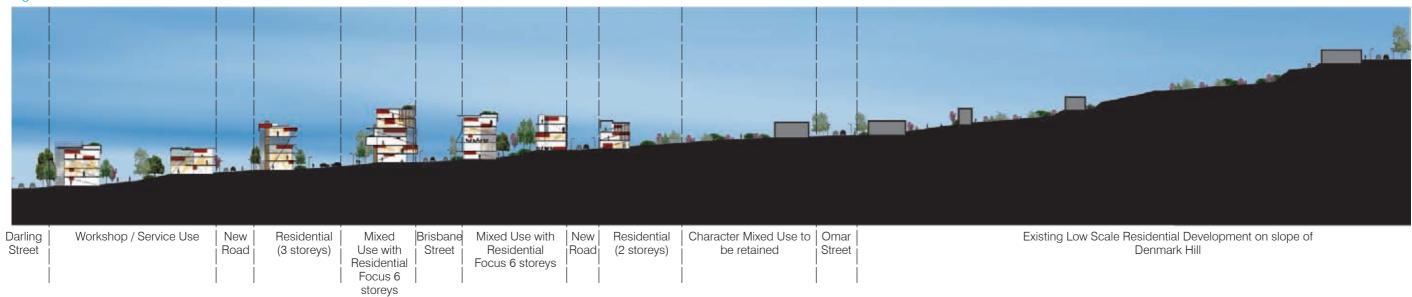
Looking south along Brisbane Street Boulevard demonstrating mixed use development up to 6 storeys.
